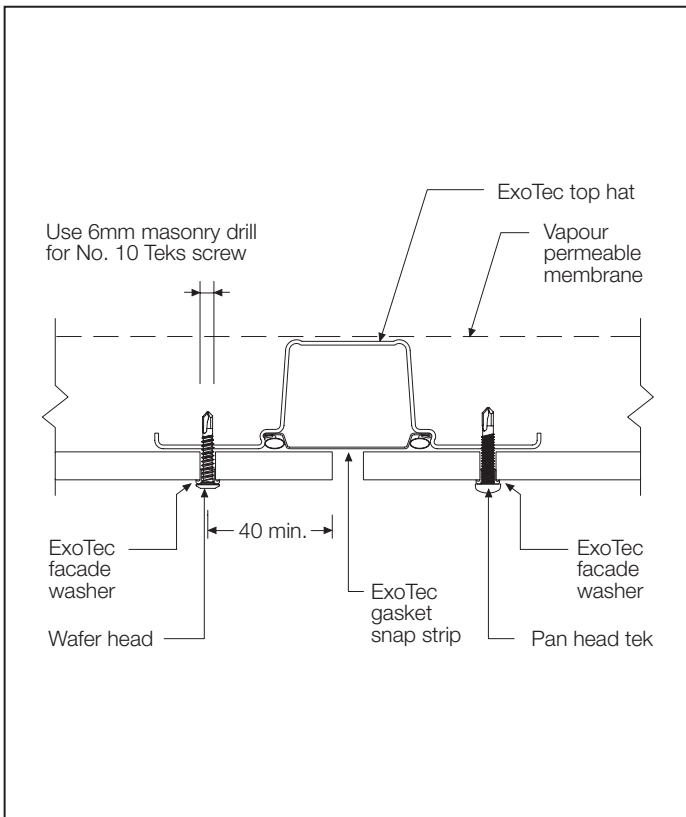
EXPOSED HEAD FASTENER DETAIL
